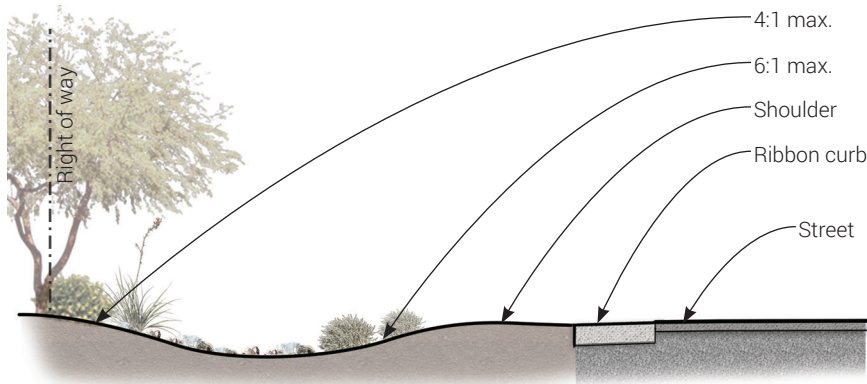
TYPICAL CROSS SECTION FOR ROADSIDE SWALES
